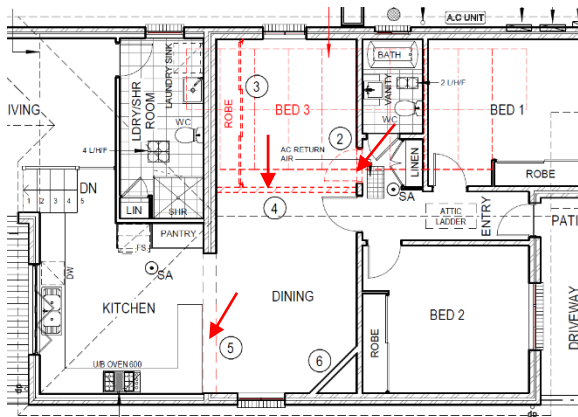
Proposed internal demolition plan with items to be demolished/infilled indicated in red (Source: Addbuild, Ground Floor – Demolition, Sheet 03A, 31.07.24)
